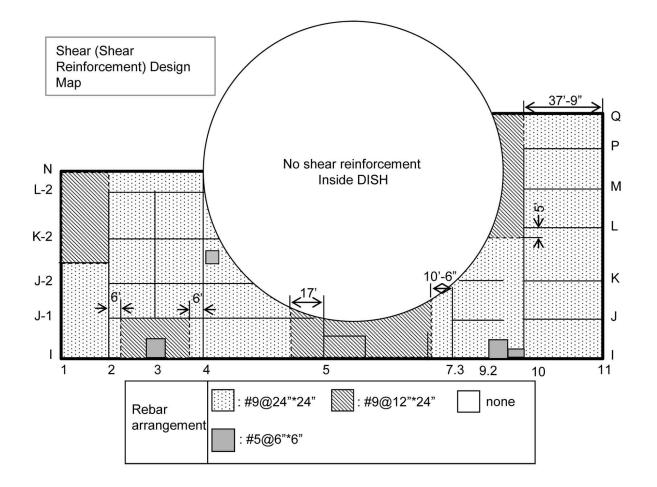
(Sheet 7 of 7) Shear Reinforcement Map
